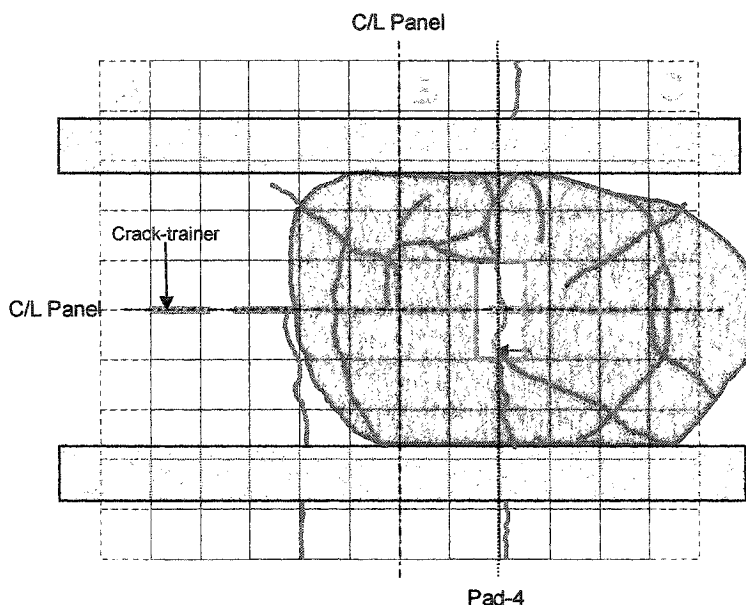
Panel-B: Crack Pattern on Soffit after Failure
